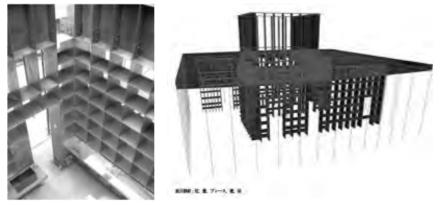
Tsuda Veterinary Clinic. Steel grid structure composed of 6 mm plate elements without a backboard. Buckling is controlled by the placement of the grid wall. Architect: Kazuhiro Kojima, Structure : Jun Sato.
